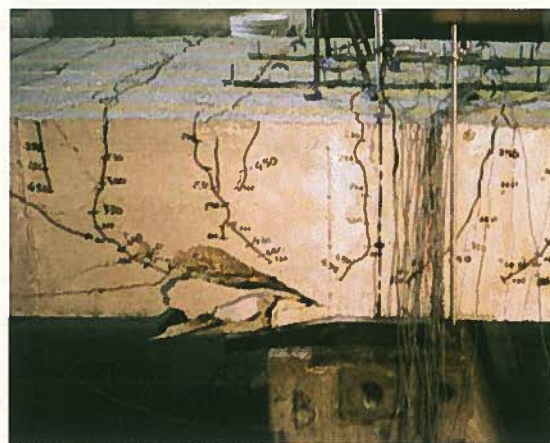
Overview and closeup of typical failure due to crushing of concrete for cantilever specimens.
